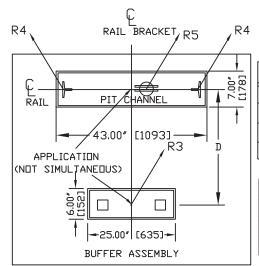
Rail Bracket Dimensions and Support Wall Orientation
